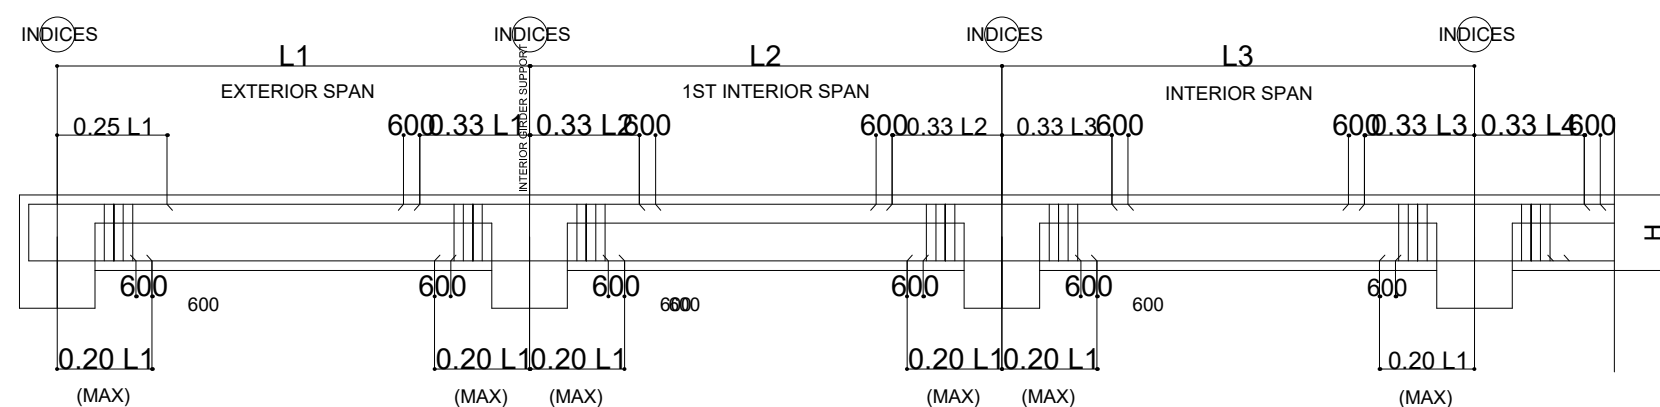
TYPICAL BAR DETAILS FOR BEAMS
